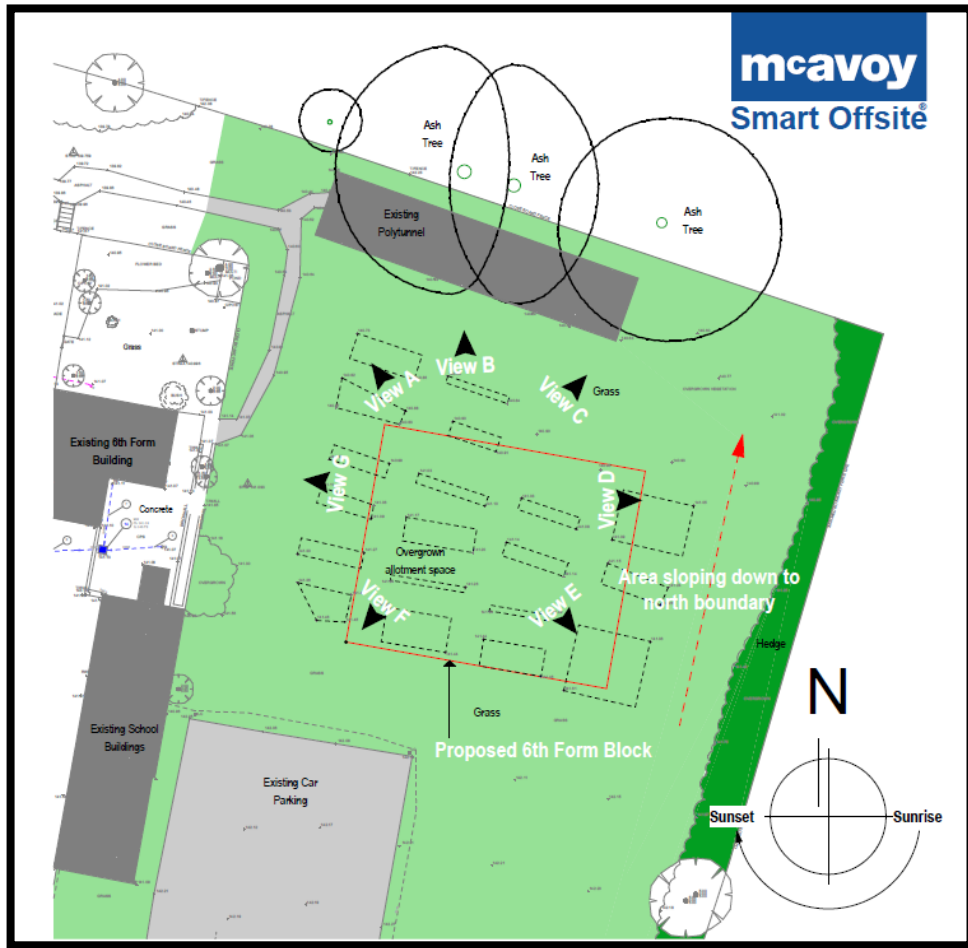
Map showing the location of the proposed block within the School Site (Extracted from Design and Access Statement)
